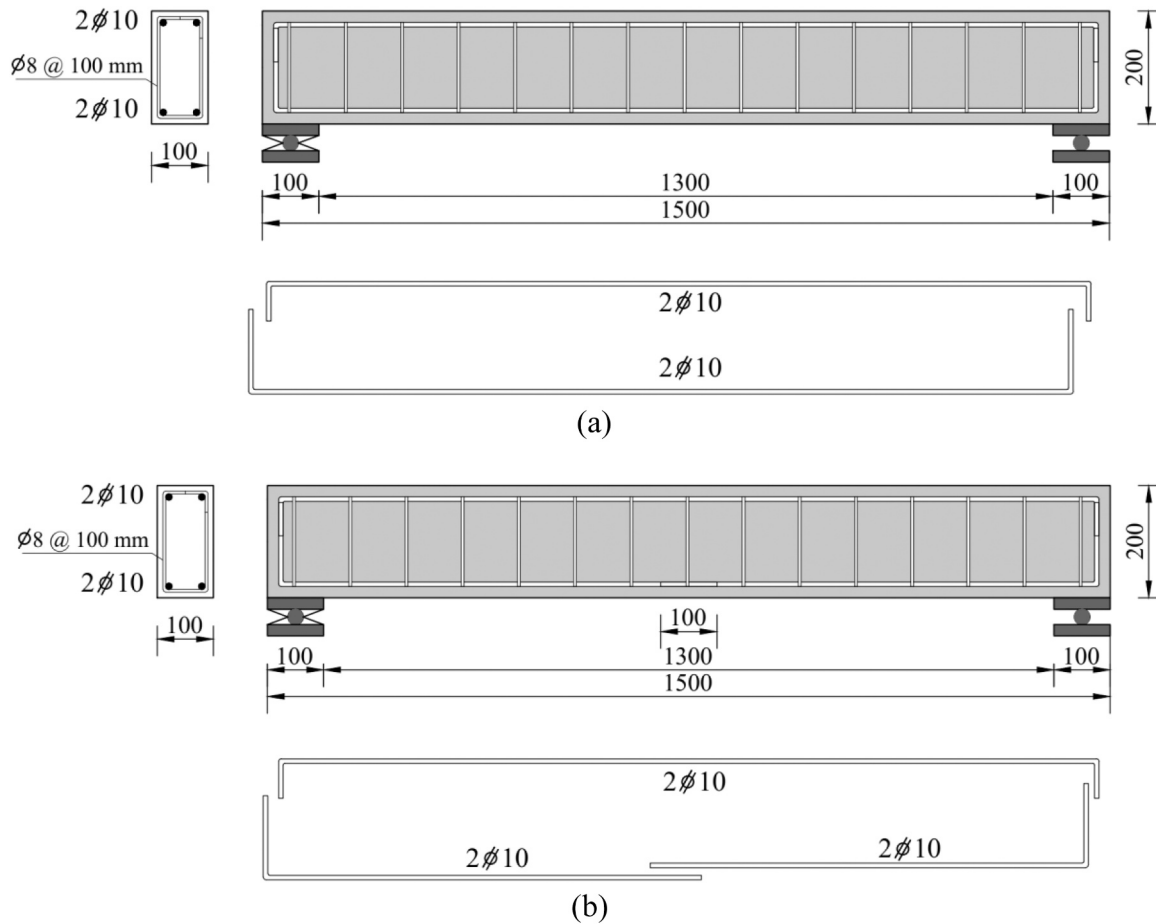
Geometric and reinforcement details of the beams: (a) Master beam; and (b) Defected beam. (Units: mm).
